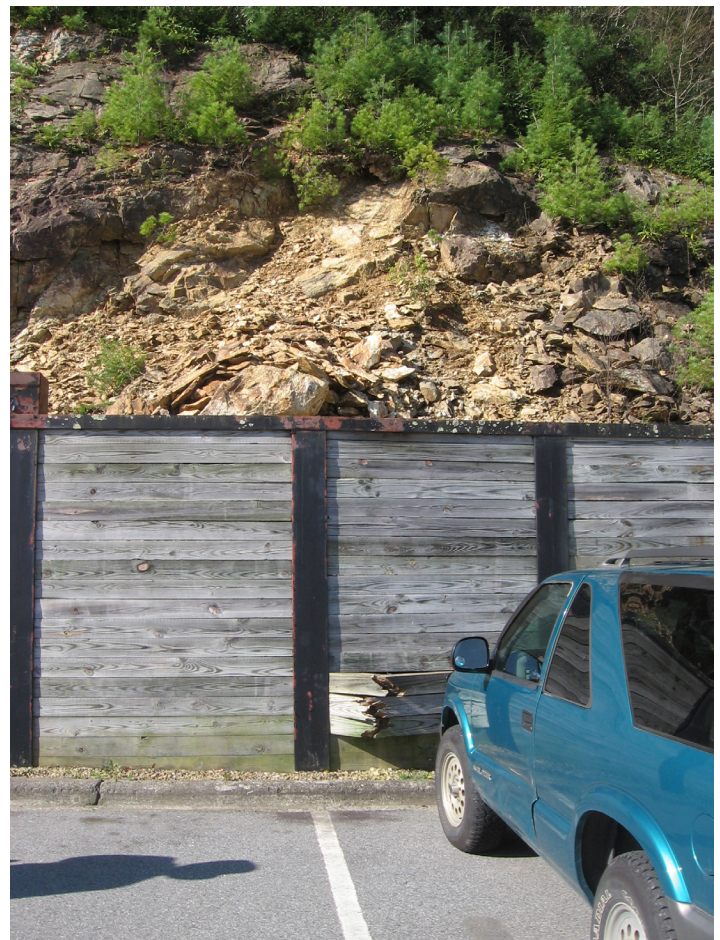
Rockslide damage to the timber lagging of the retaining wall in Figure 7. 2015/04/28 NCGS photograph.
